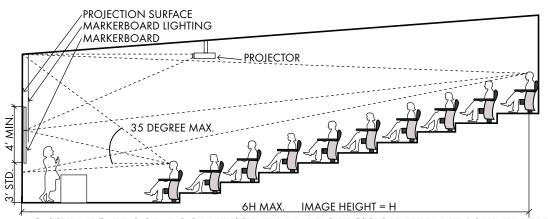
FIGURE C: TIERED FLOOR ROOM WITH WALL PROJECTION KEY MEASUREMENTS
